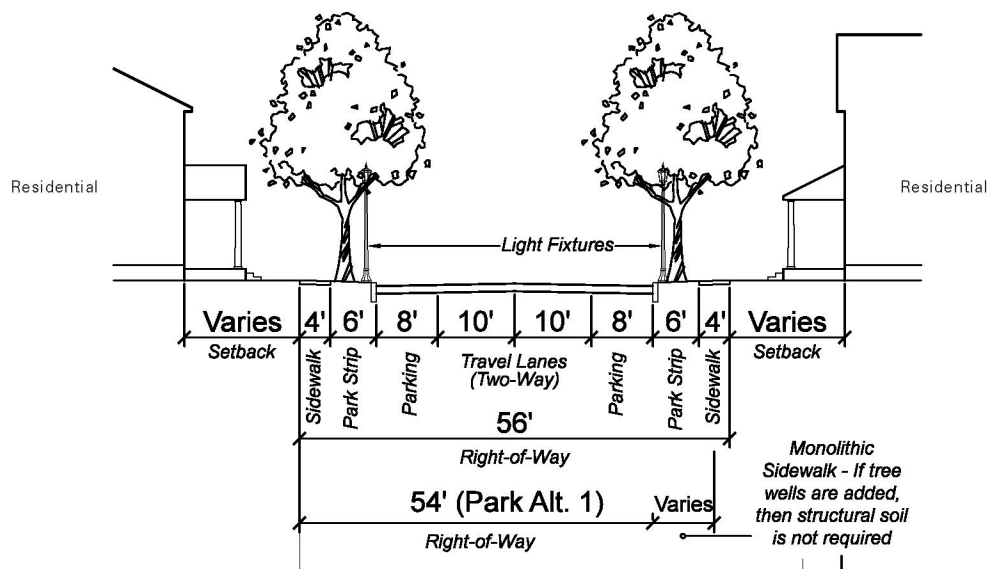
Proposed Section and Plan: Neighborhood Street A
